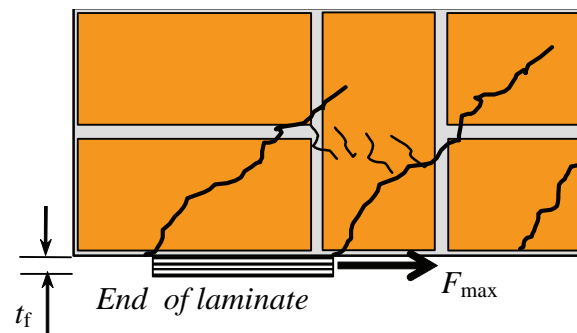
Failure due to rip-off of the anchorage brick.
